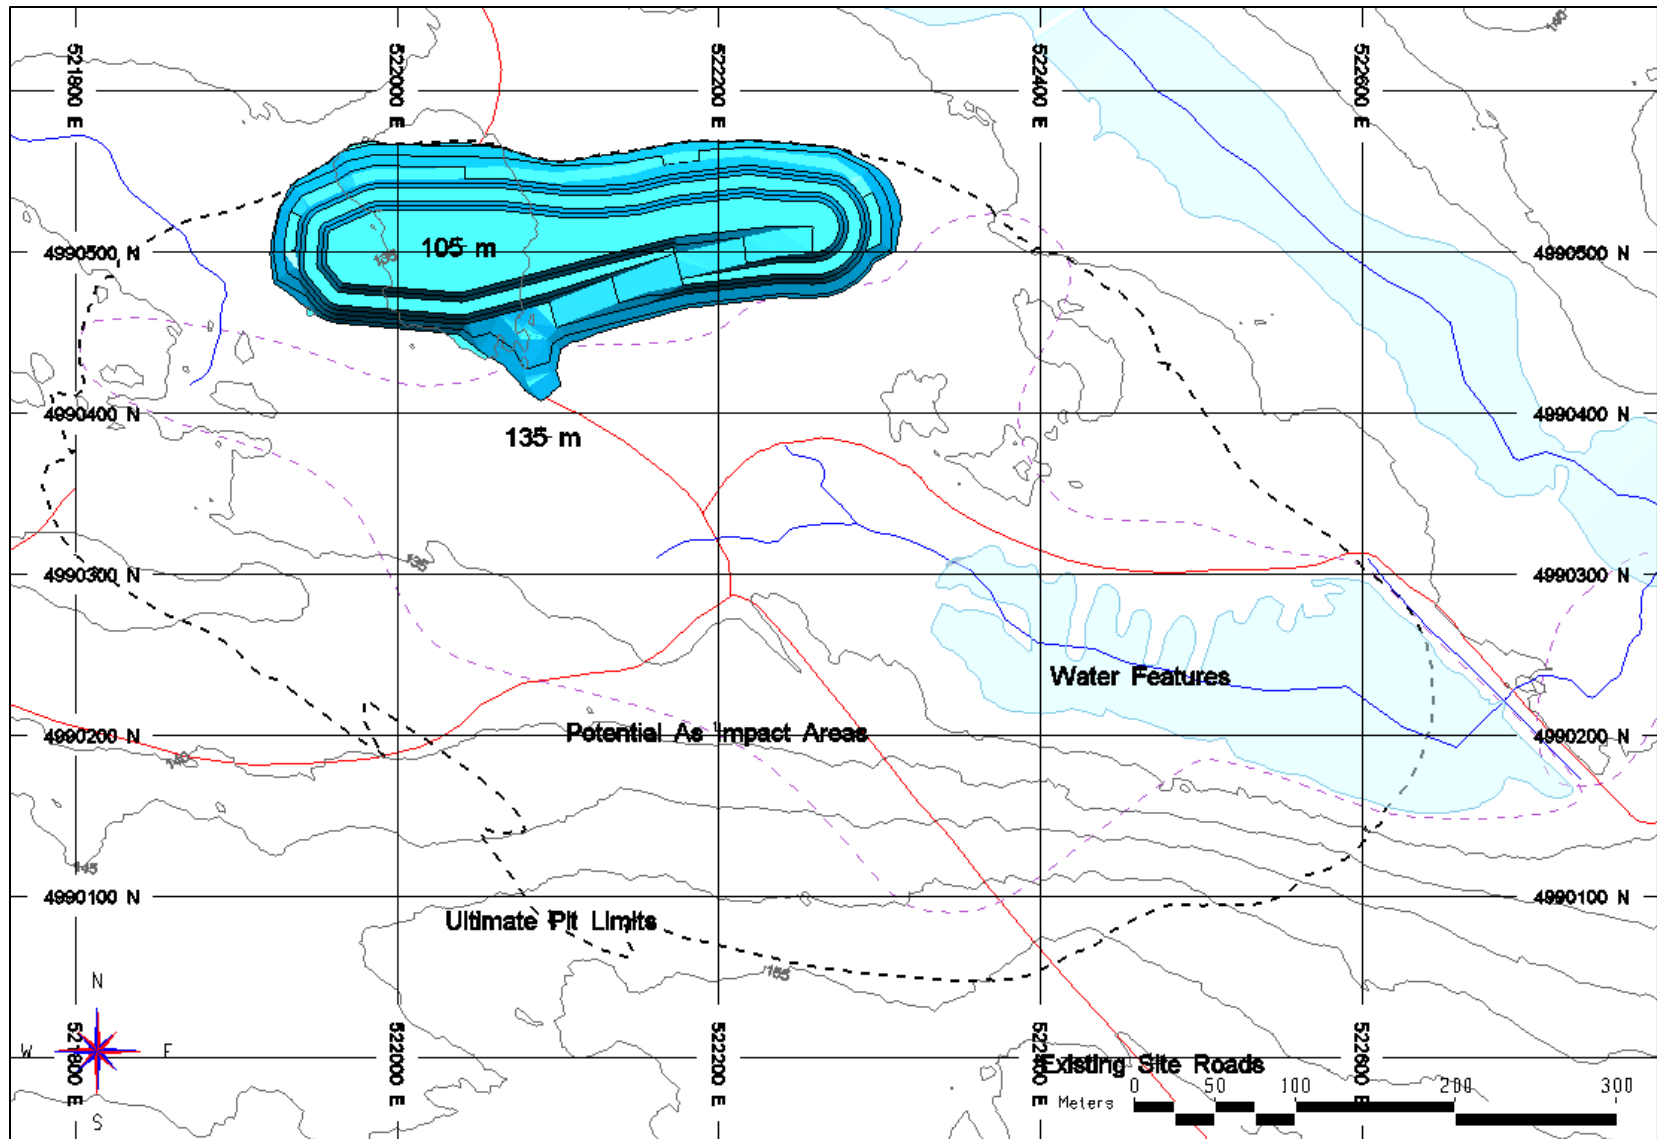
Phase 0 Detailed Pit Design, P610, Plan View (not for construction)
